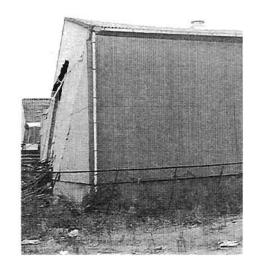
Mid-side failure of long steel frame shed
